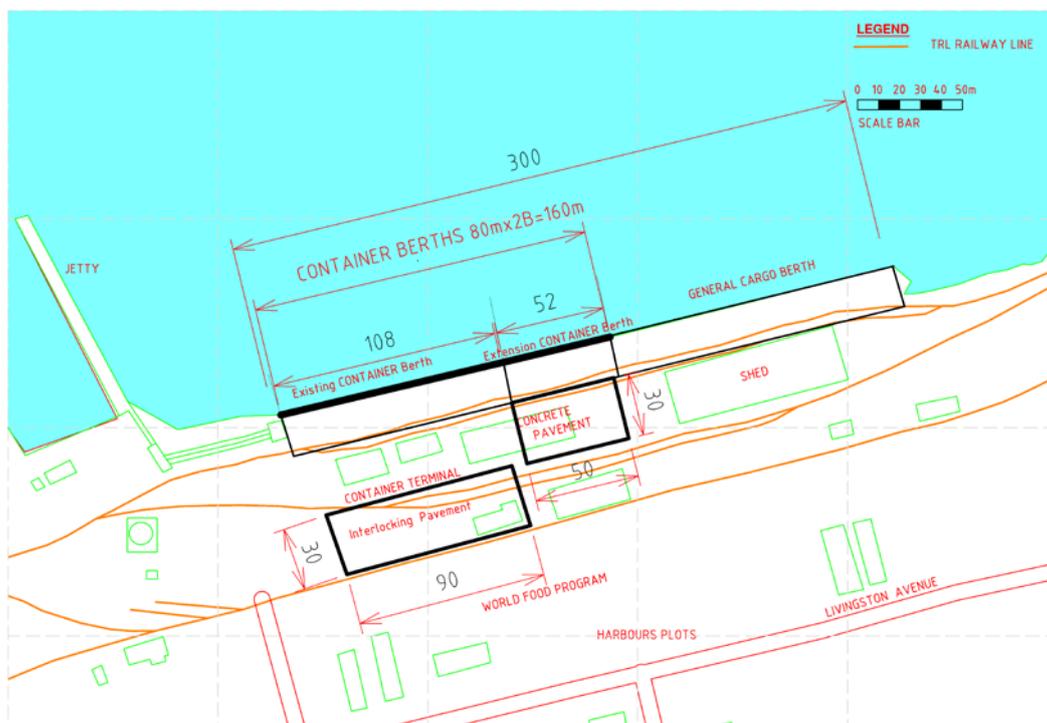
General Layout of Short-Term Development Plan for Kigoma Port
